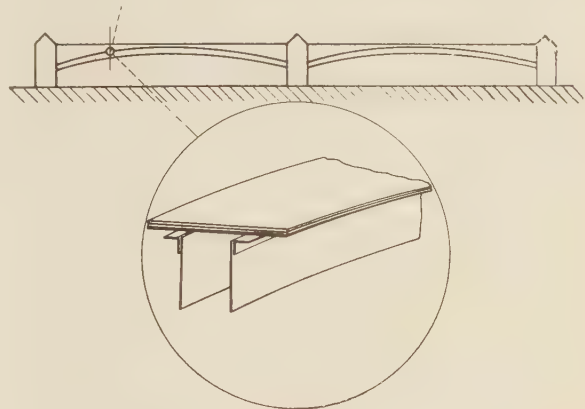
DIAGRAM OF ARCH BRIDGE AND POINT WHERE TEST WAS MADE
